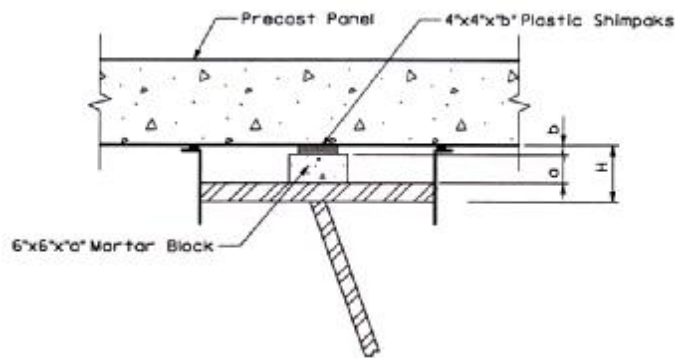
Details of elevation adjustment and built-up haunch
